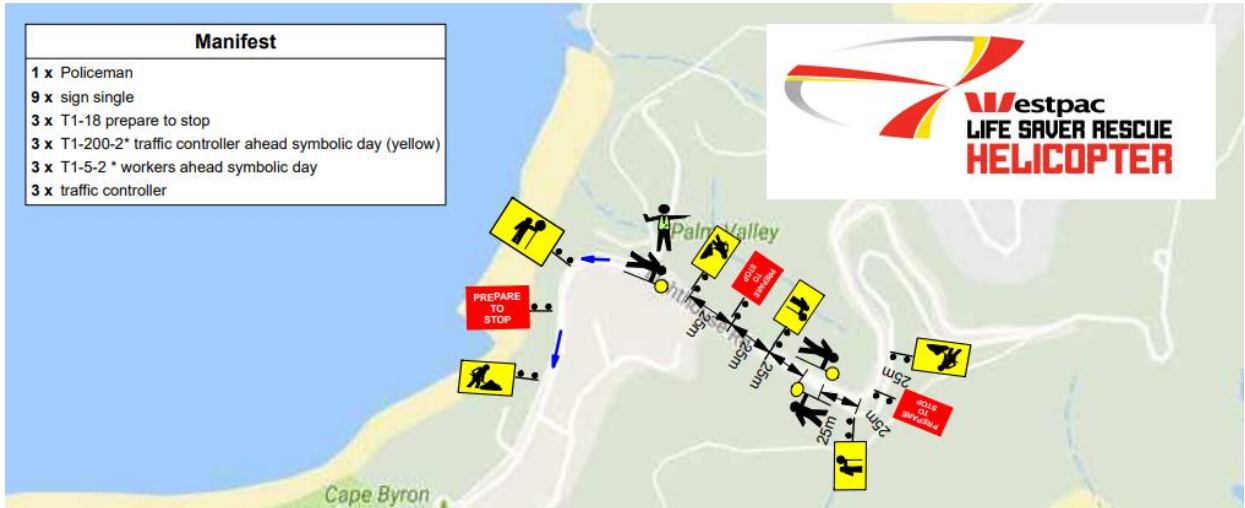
Traffic control proposed for eastern section Lighthouse Road. Coming down from Lighthouse Road (refer to Figure 1). Traffic control to be in place from 6am to 10.30pm.
